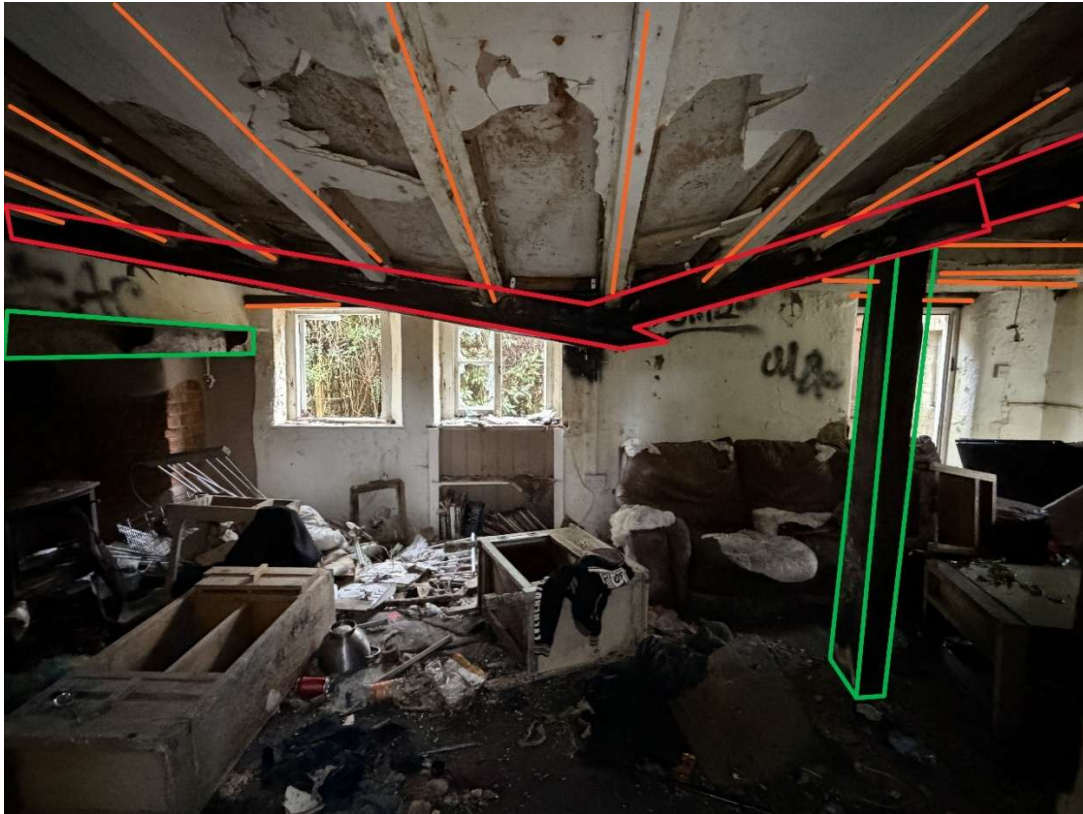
Internal ground floor structural timber elements to retain (green), review/repair (orange) or replace (red) (Jan '26 images).
